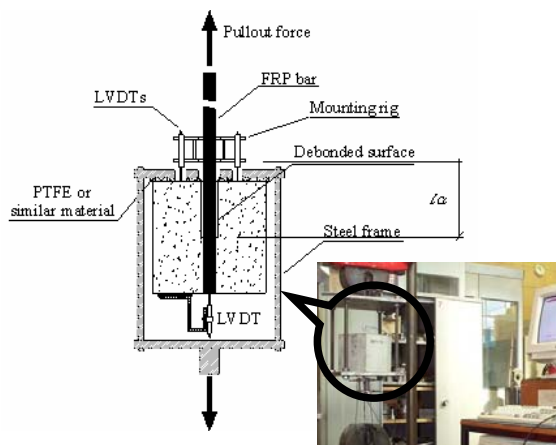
Details of the positioning of the bar and LVDT's in the GFRC specimen and loading frame.
